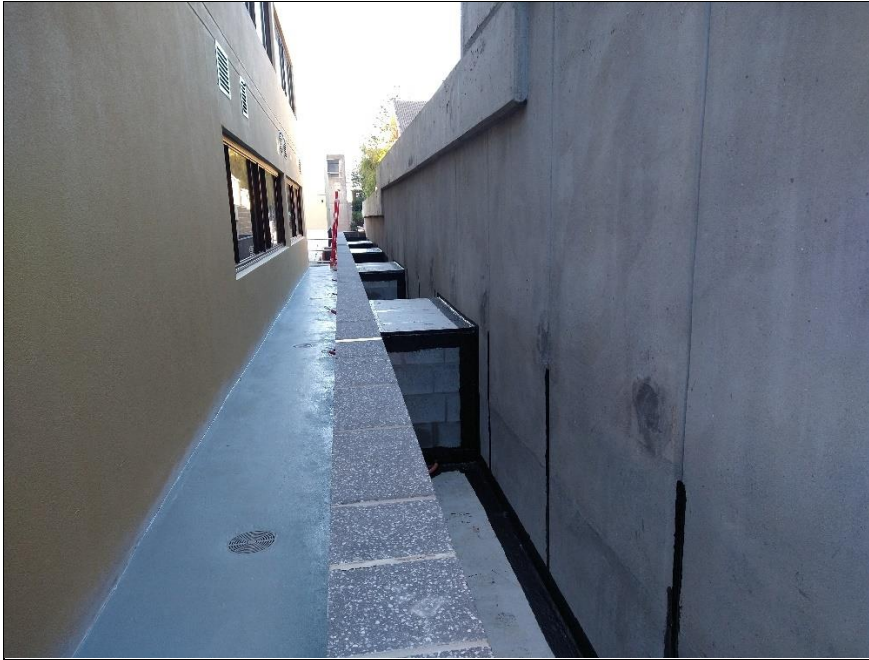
Concrete footpath (capping) and garden beds over concrete to rear of Education Building (13 July 2021)
